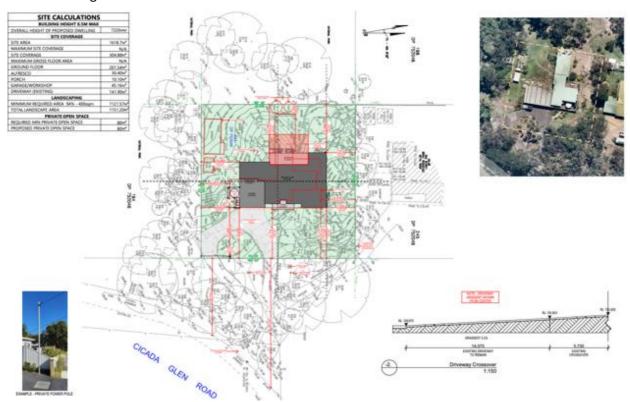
Proposed Site Plan. Source: Elcom Homes, Rev C, 30/01/2025.
